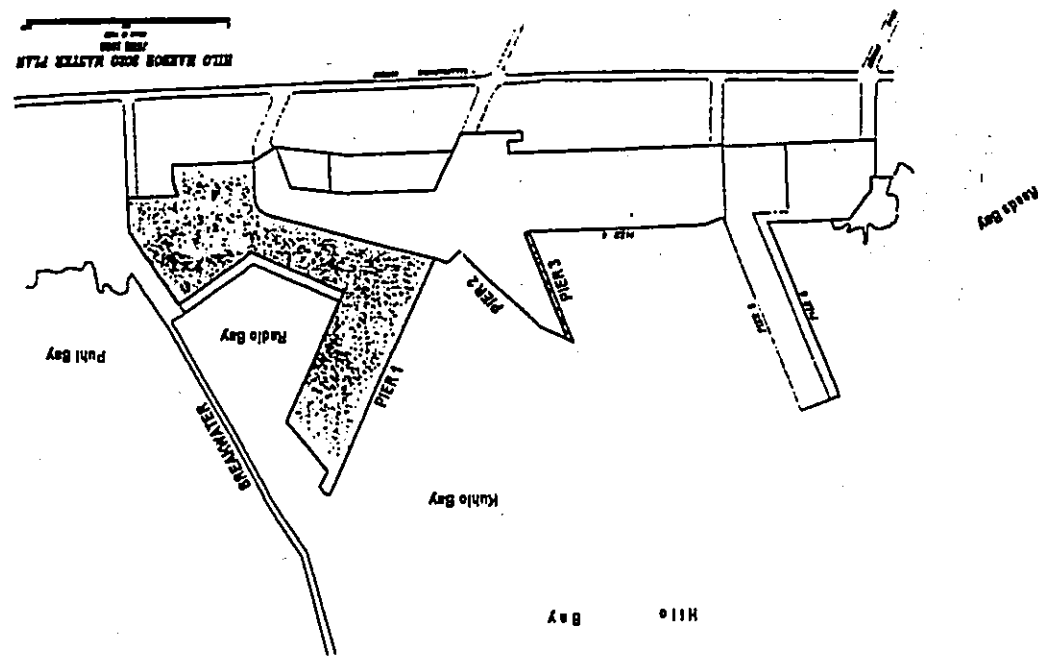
Hilo Harbor showing existing Piers 1-3 and proposed Piers 4-6.
